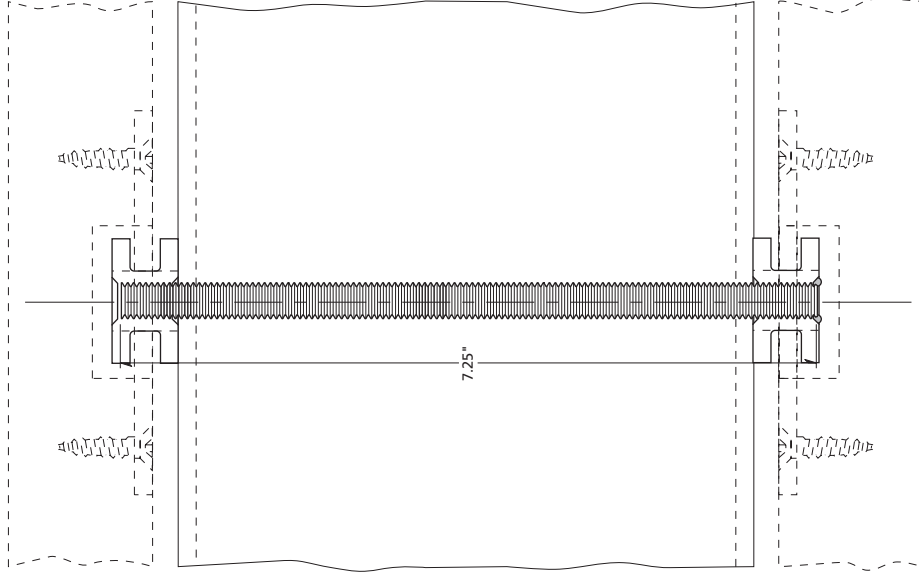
" x 6" RAIL PLUG SIDE ELEVATION B-B
